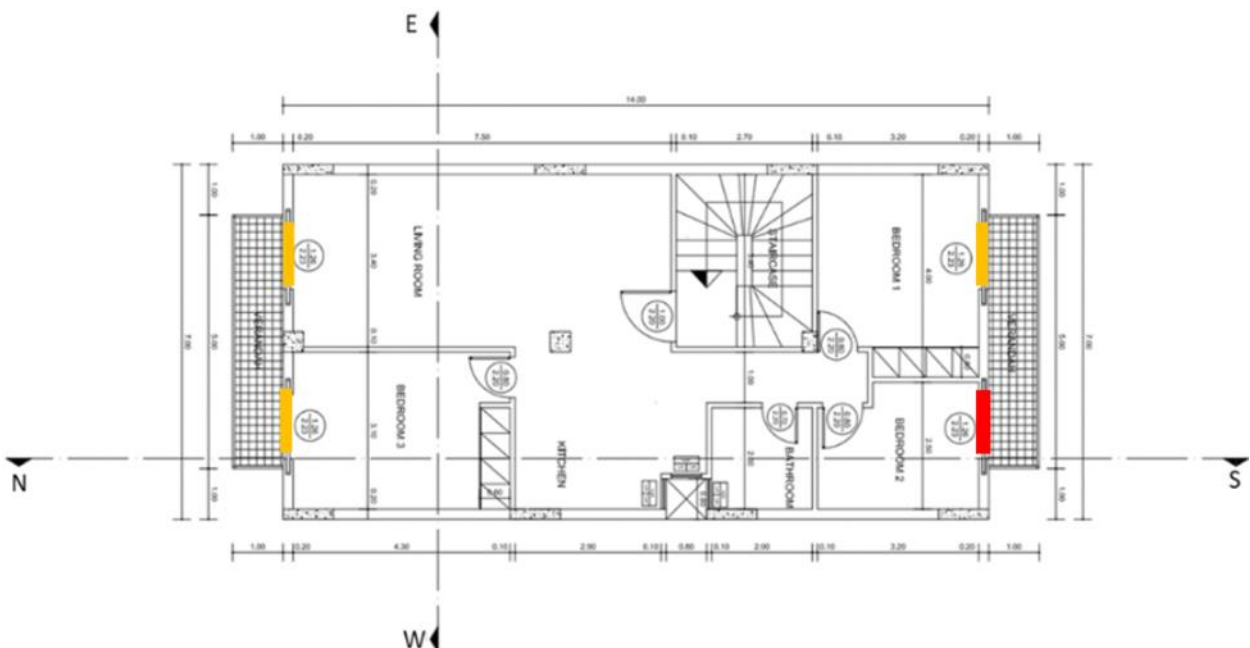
The floor plan of the demo apartment – with red colour is showcased the window that will be replaced by PV vacuum glazing
